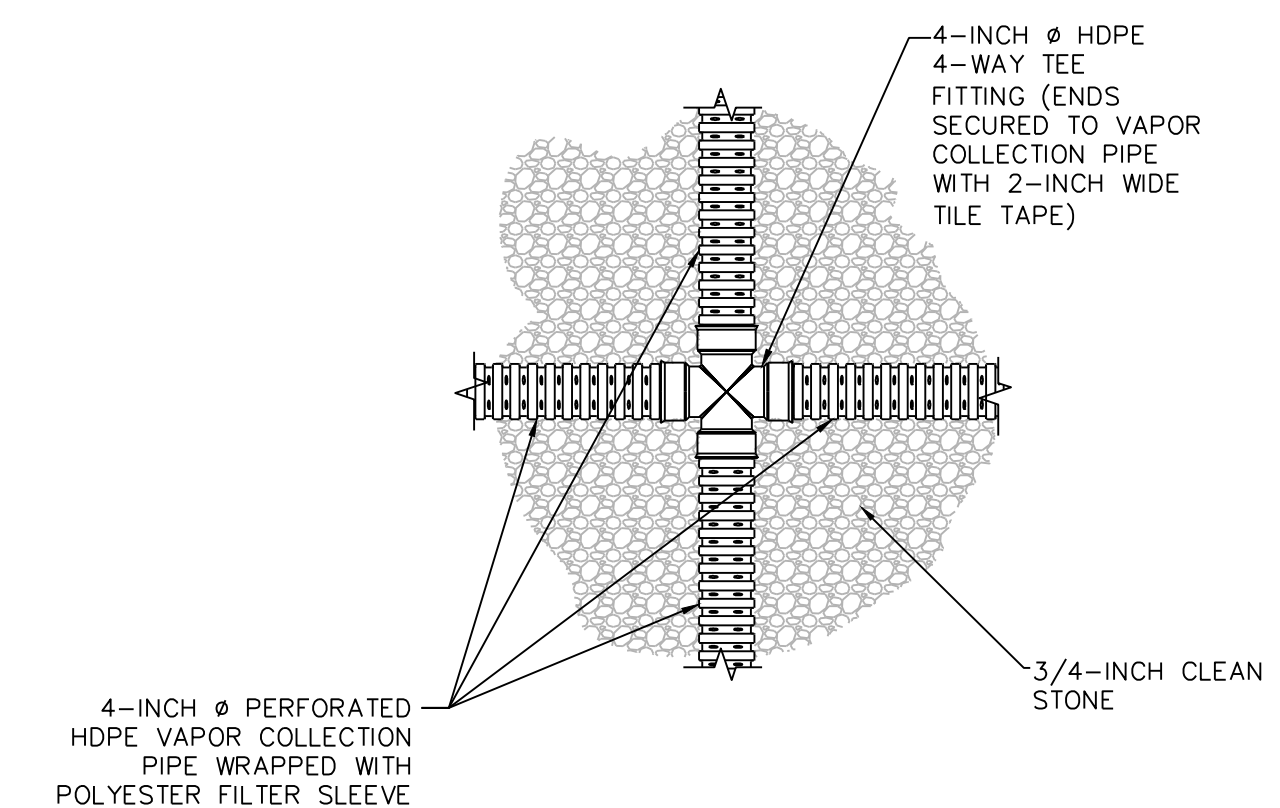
TYPICAL COUPLER CONNECTION FOR VAPOR COLLECTION PIPE
